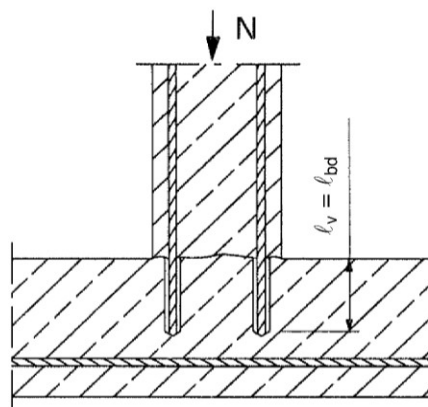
Overlapping joint at a foundation of a wall or column where the rebar are stressed in tension
